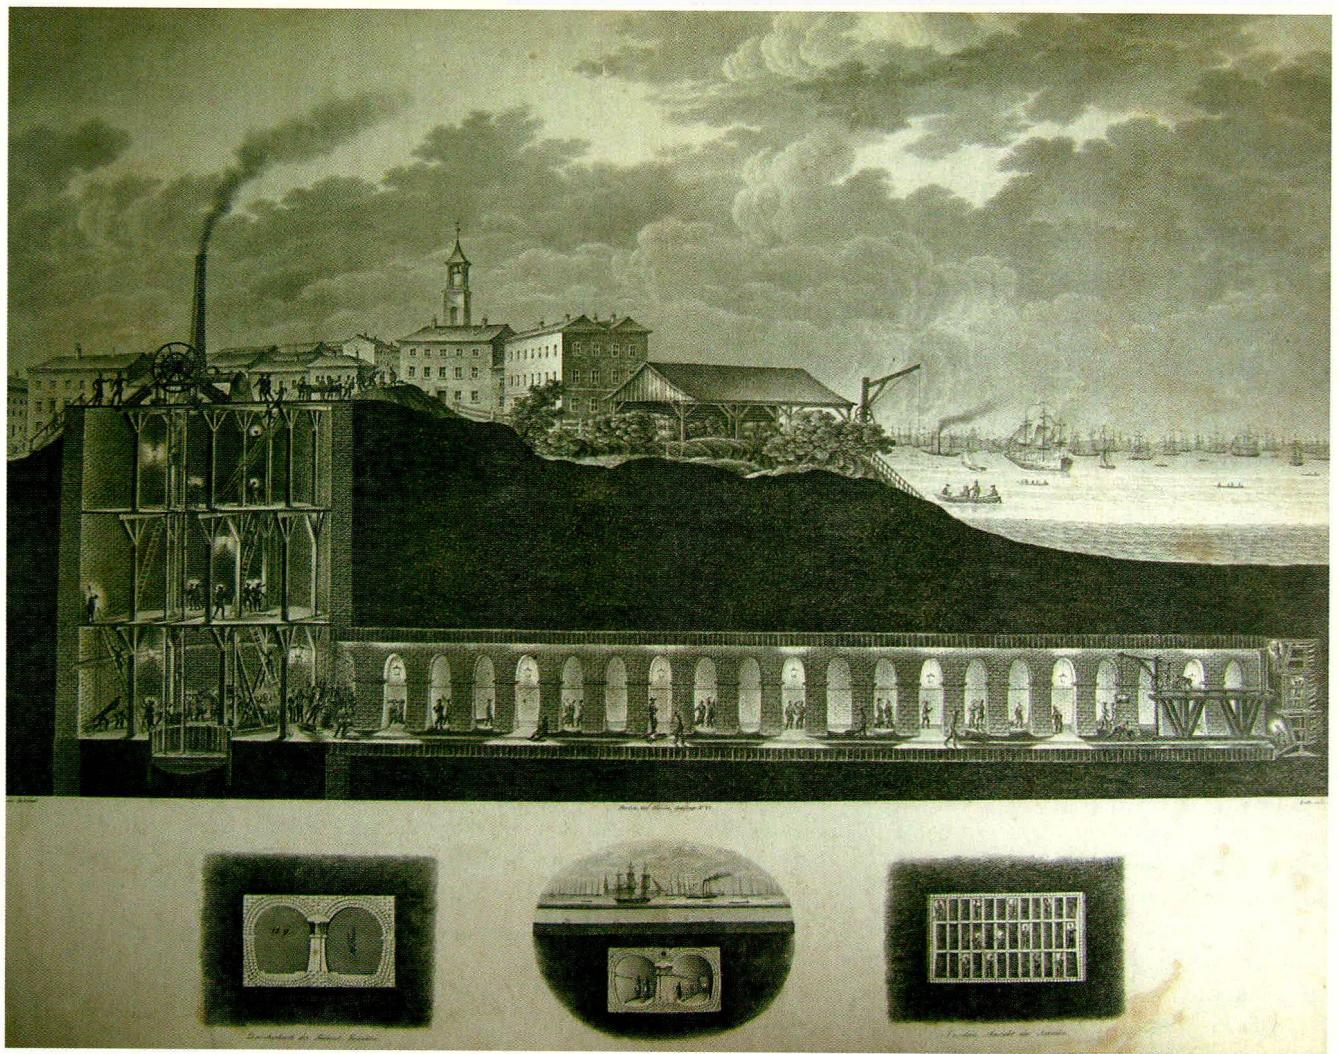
The shaft and tunnel under construction, 1827. [Foto: Elton Collection]<sup>14</sup>
